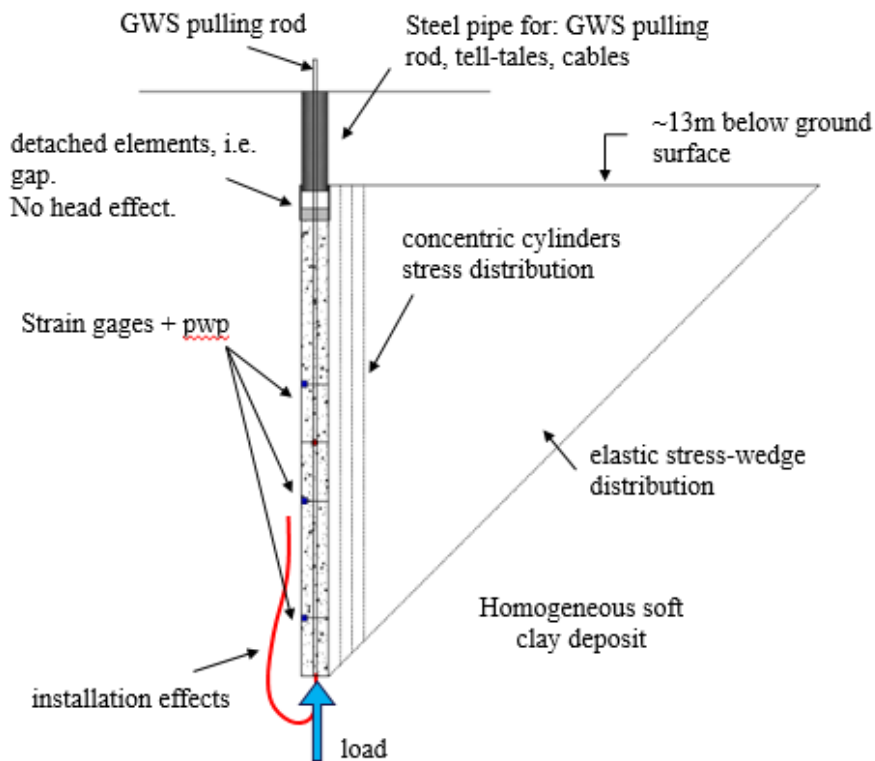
Sketch of the steel guiding pile and concrete pile. Note that the concrete pile is 13m below the ground surface.
